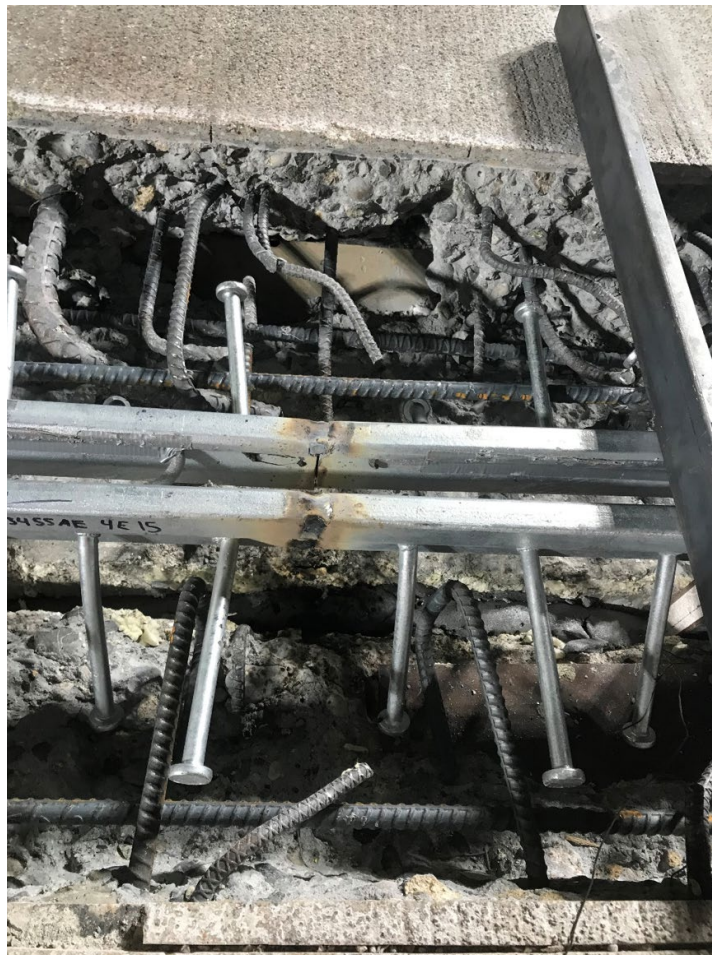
Placement of Splices in the Joint Seal Assembly
